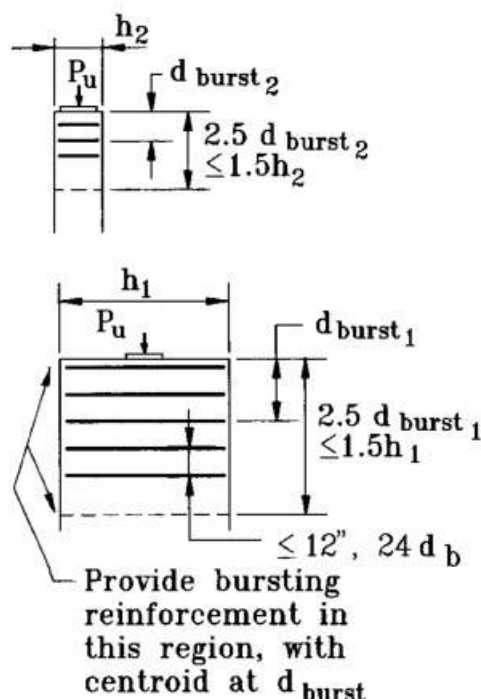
1—Arrangement for Bursting Reinforcement
